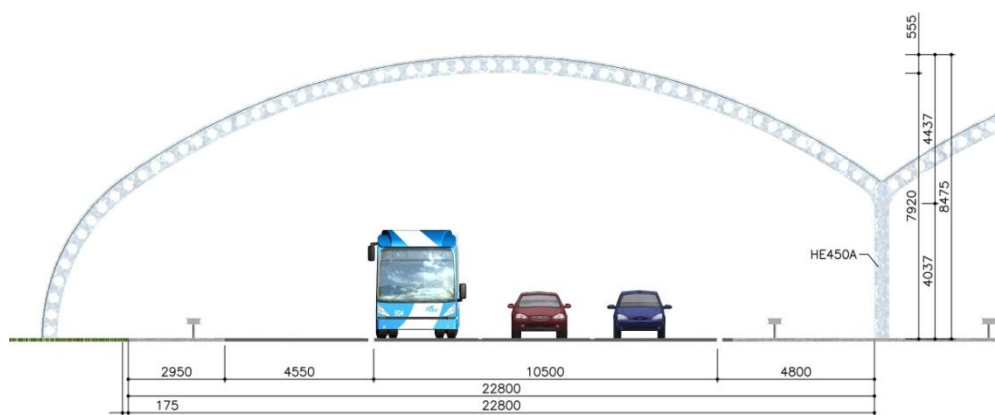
, cross section of the Sustainable Highway (Vákár L. I., 2008)
